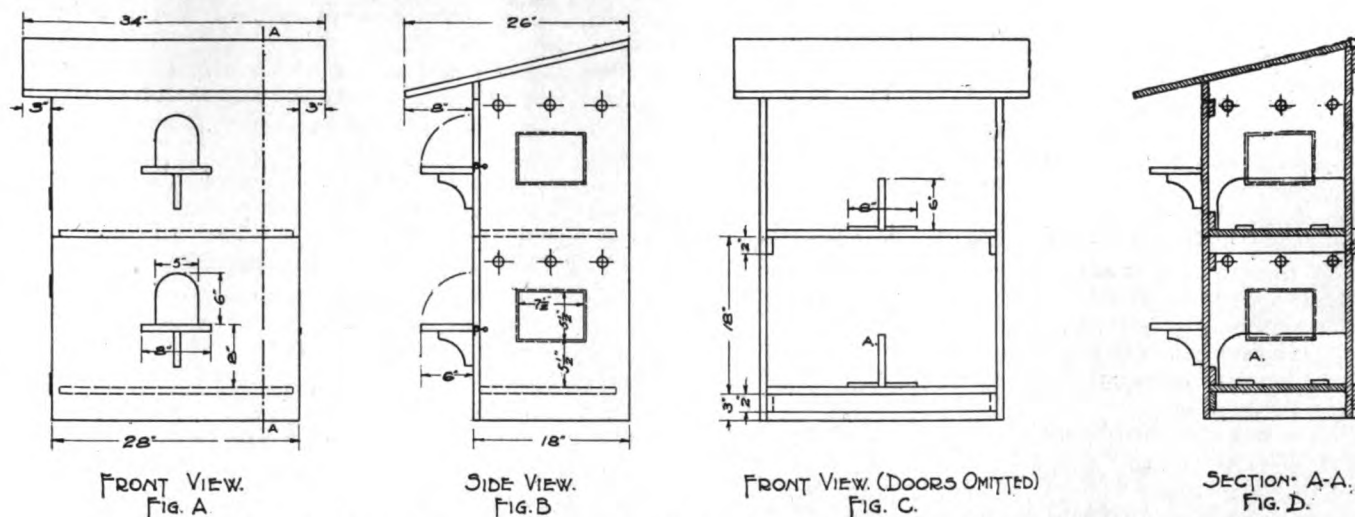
PLATE XIV—A DOUBLE DECK WALL NESTING PLACE FOR PIGEONS, AFTER DR. TREUBENBACH.
